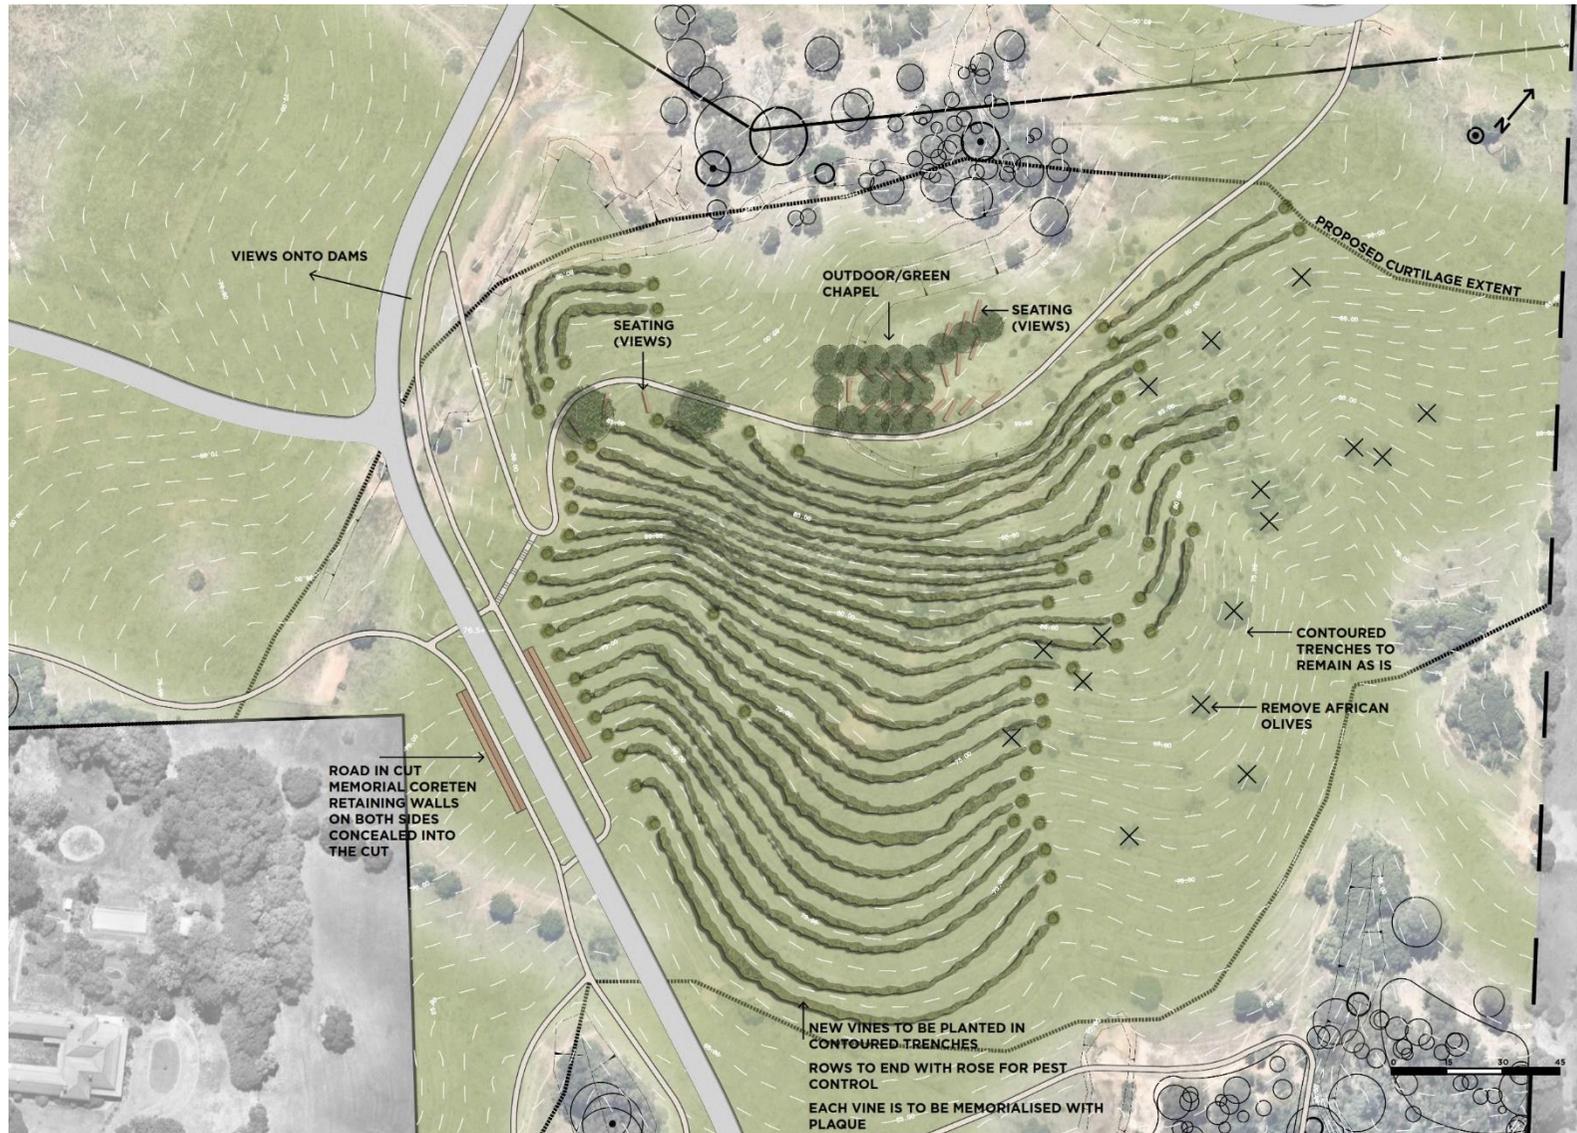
Proposed design plan for outbuildings precinct. Source. Florence Jaquet, Landscape Architect.
